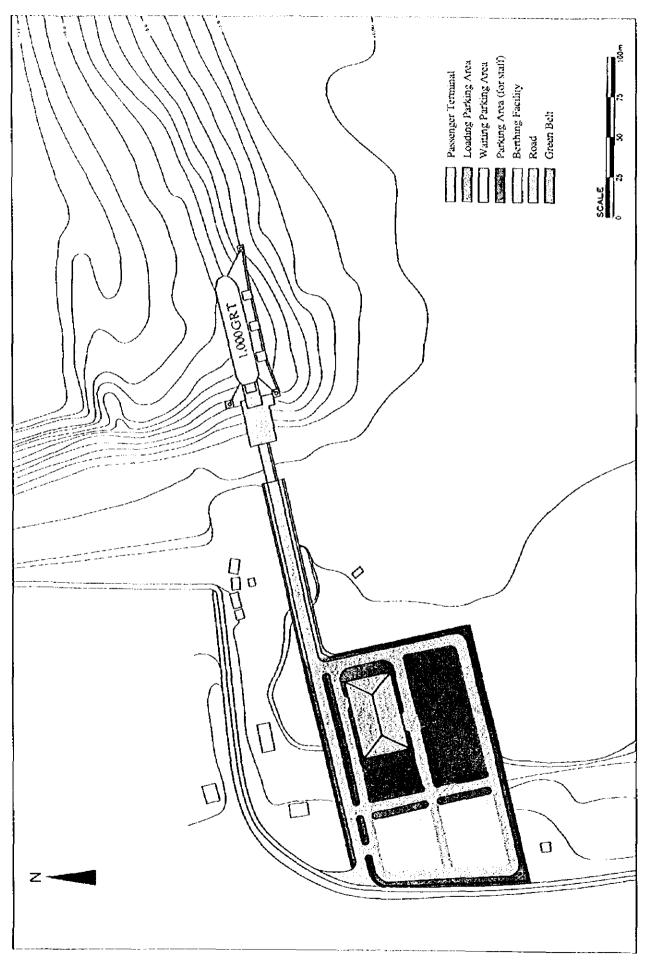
Layout Plan of Wahai Ferry Terminal
